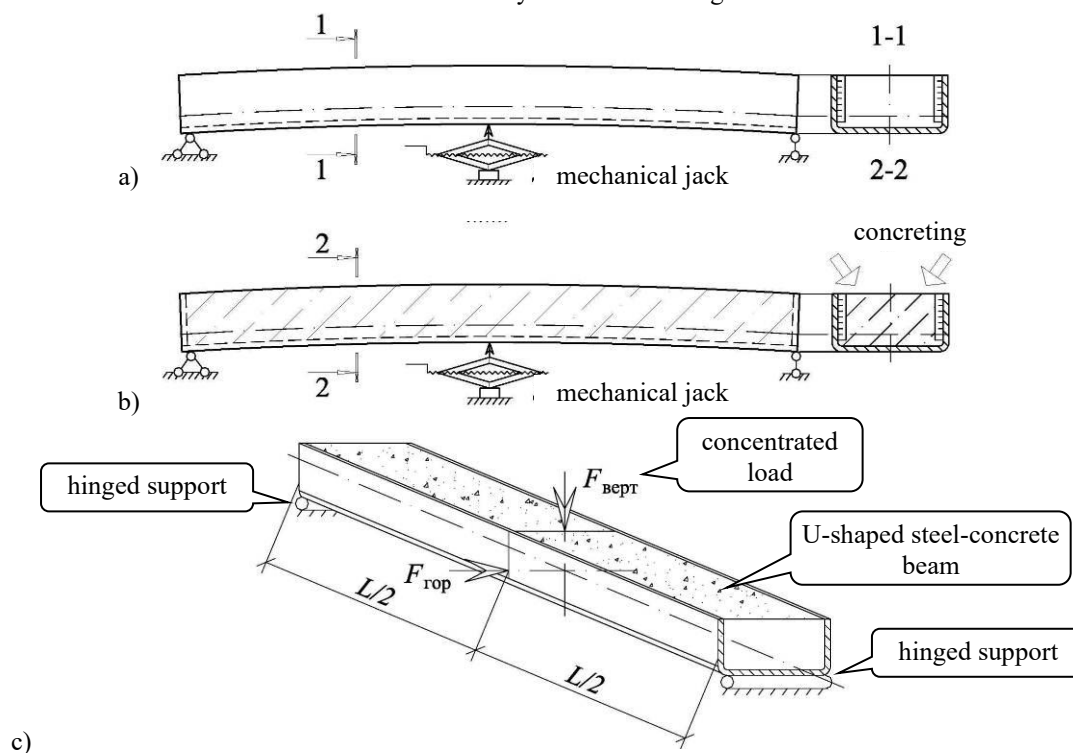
Schemes of creating a prestressed steel-reinforced concrete structure: a) steel element; b) transformation of the steel element into a steel-reinforced concrete element; c) service loading scheme
